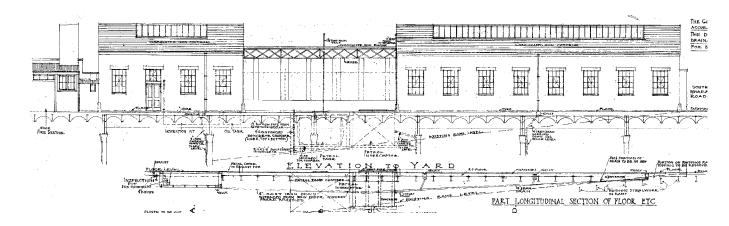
Plate I: Extract showing detail of section and elevation of 'New Transport Service Station'
